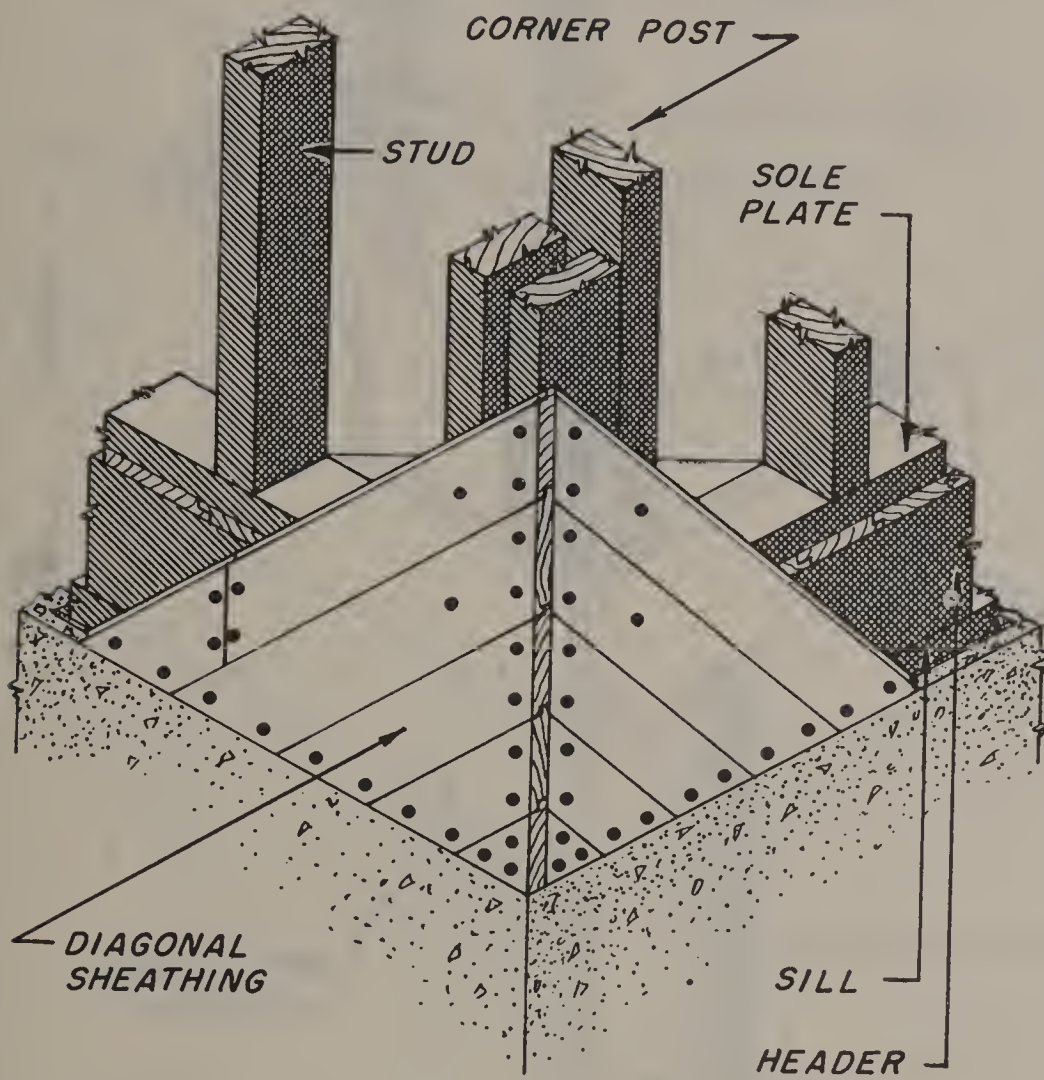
Diagonal wall sheathing. Use eightpenny nails. For boards 8 inches and less in width, use two nails at each end of each board, two nails through each board into studs, and three nails through each board into the corner post assembly. For wider boards use an additional nail at each of these points. Joints in adjacent runs of sheathing boards should preferably be separated by at least two stud spaces. Many of the houses that were undamaged by the 1926 and 1928 Florida hurricanes were diagonally sheathed. In addition to affording high resistance to the racking forces engendered by windstorms and earthquakes, diagonal sheathing nailed as specified effectively ties together sills, joists, plates, and studs. Note: If boards are tongued and grooved, end joints need not be made over studs.
